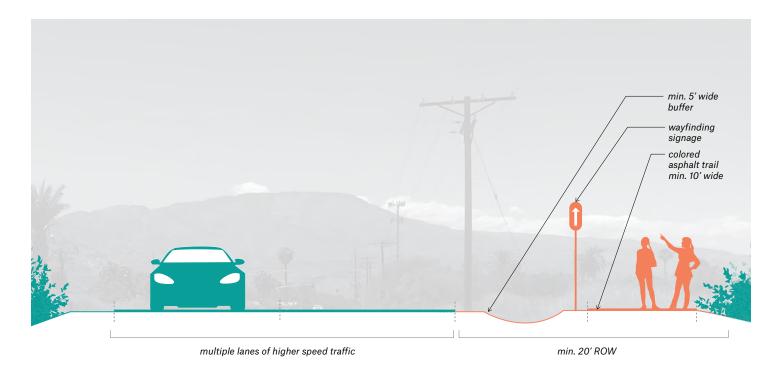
Typical Cross-Section: 10-foot Wide Class I Multimodal Path
